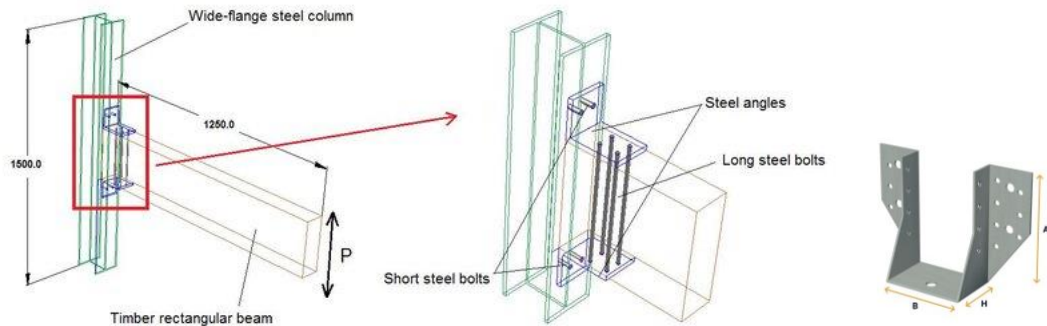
Standard joints for steel and wooden elements. (Sirumbal-Zapata et al., 2019)
